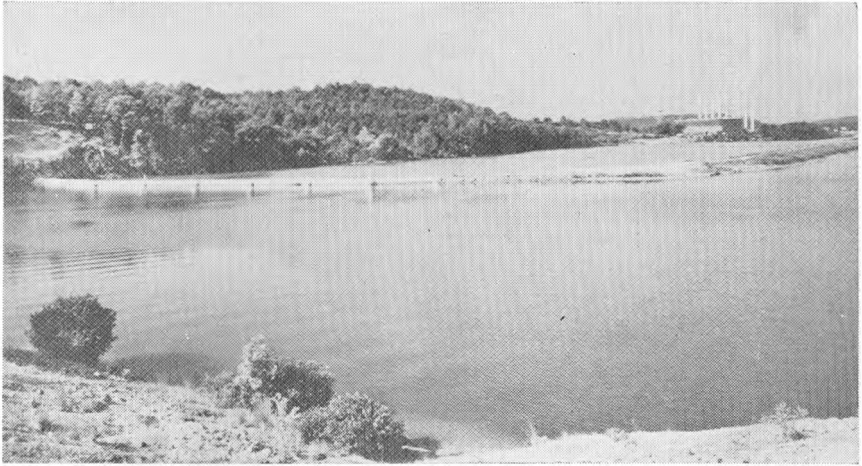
KINGSTON SKIMMER WALL AND SWAN POND DIKE.
